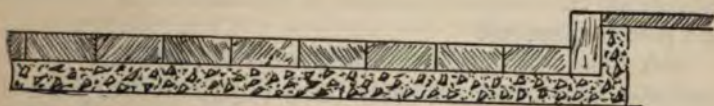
SECTION OF BRICK PAVEMENT ON CONCRETE
